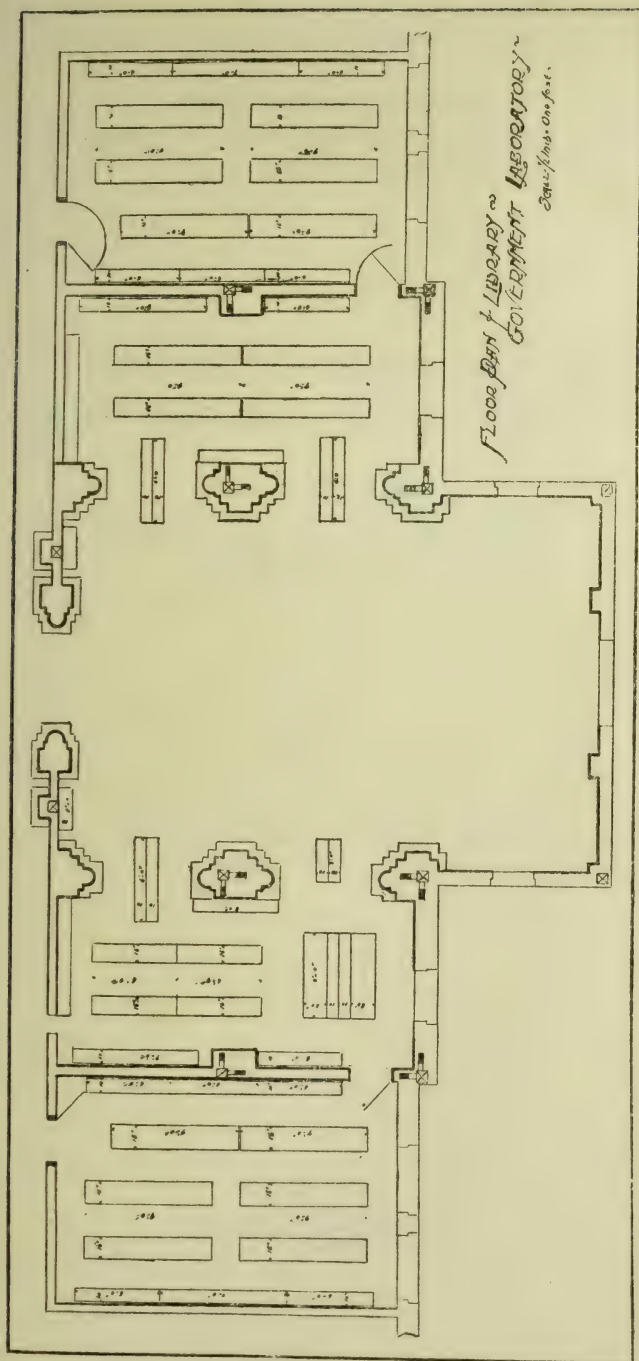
PLATE XXVII. FLOOR PLAN OF LIBRARY ROOMS.
